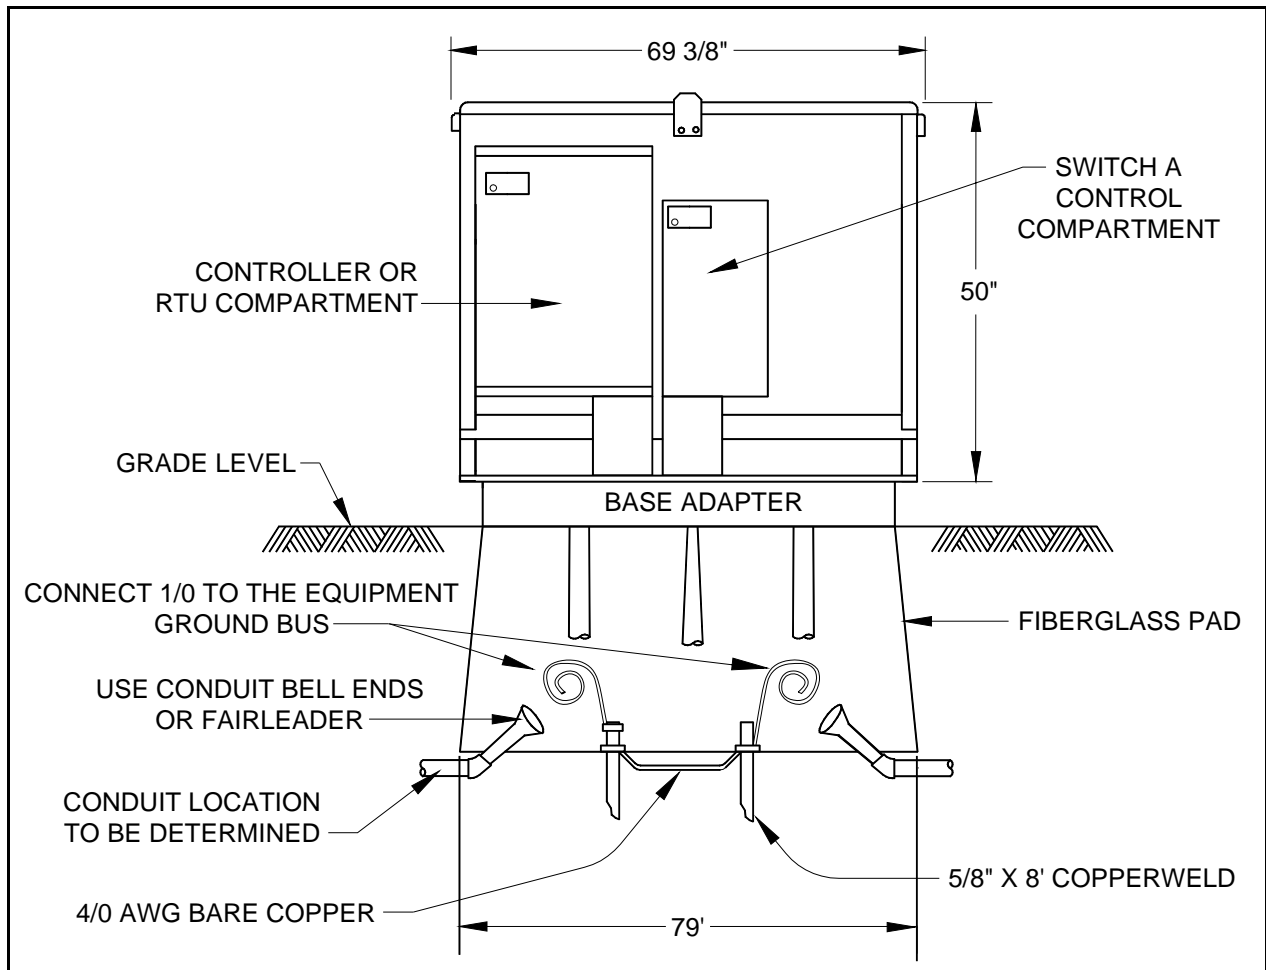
Typical 15kV, S&C Switch Mounted on Pad (RTU Compartment Side) - Side View (Motor-Operated Switch with Base Adapter)
